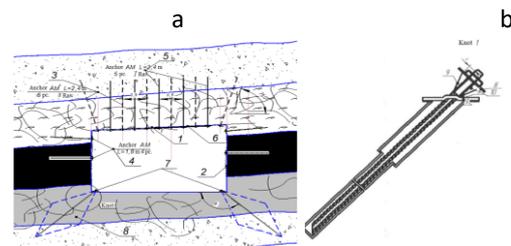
Soil anchoring installation (a) and borehole design (b)
